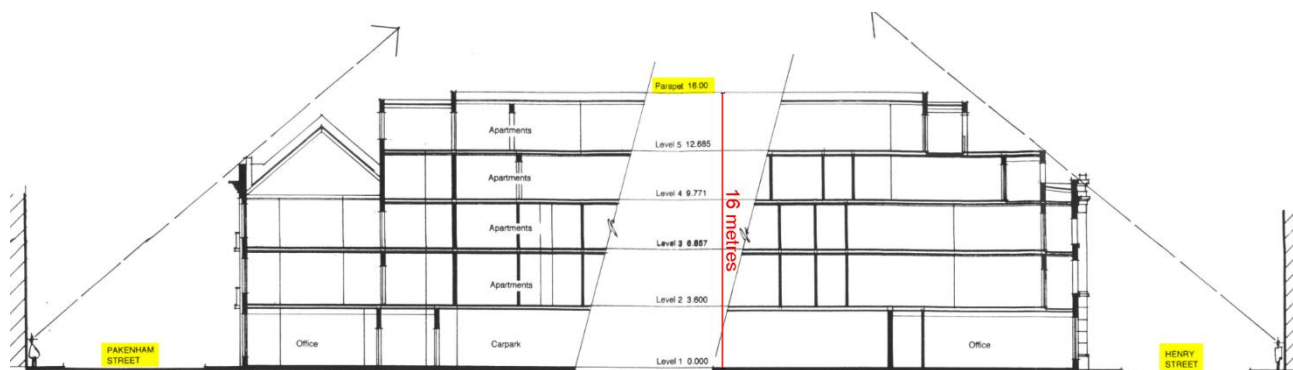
& 5 – Pakenham Street (east) elevation and the cross section of the mixed use development at 48 Henry Street abutting the subject site Note: Maximum building height of 16m.
